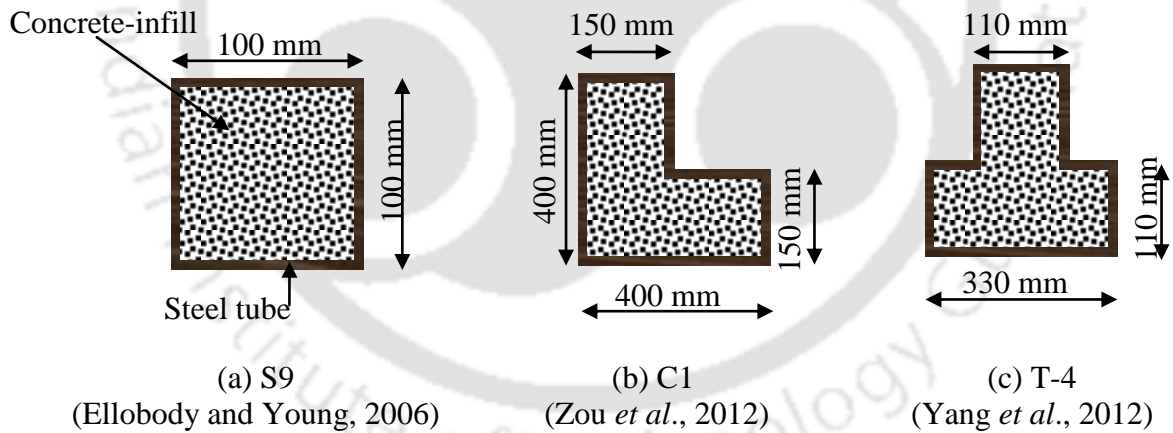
Concrete-filled steel tubular stub column specimens.
